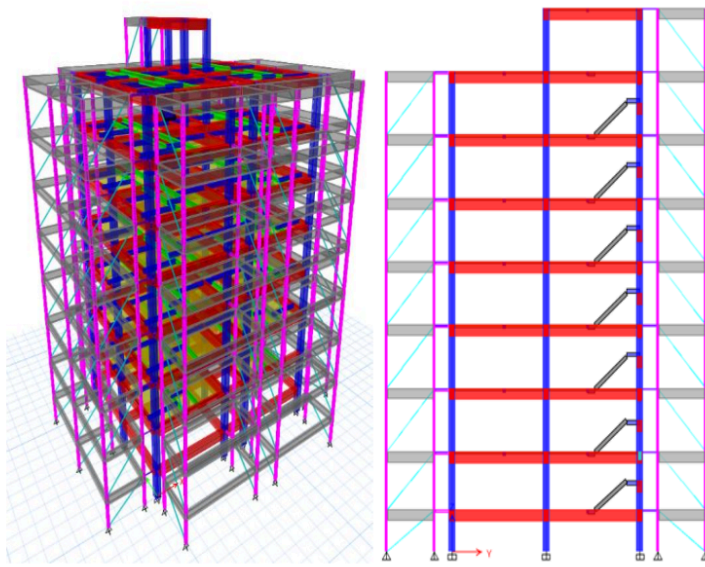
3D view and elevation of Diagonal-braced exoskeleton.
